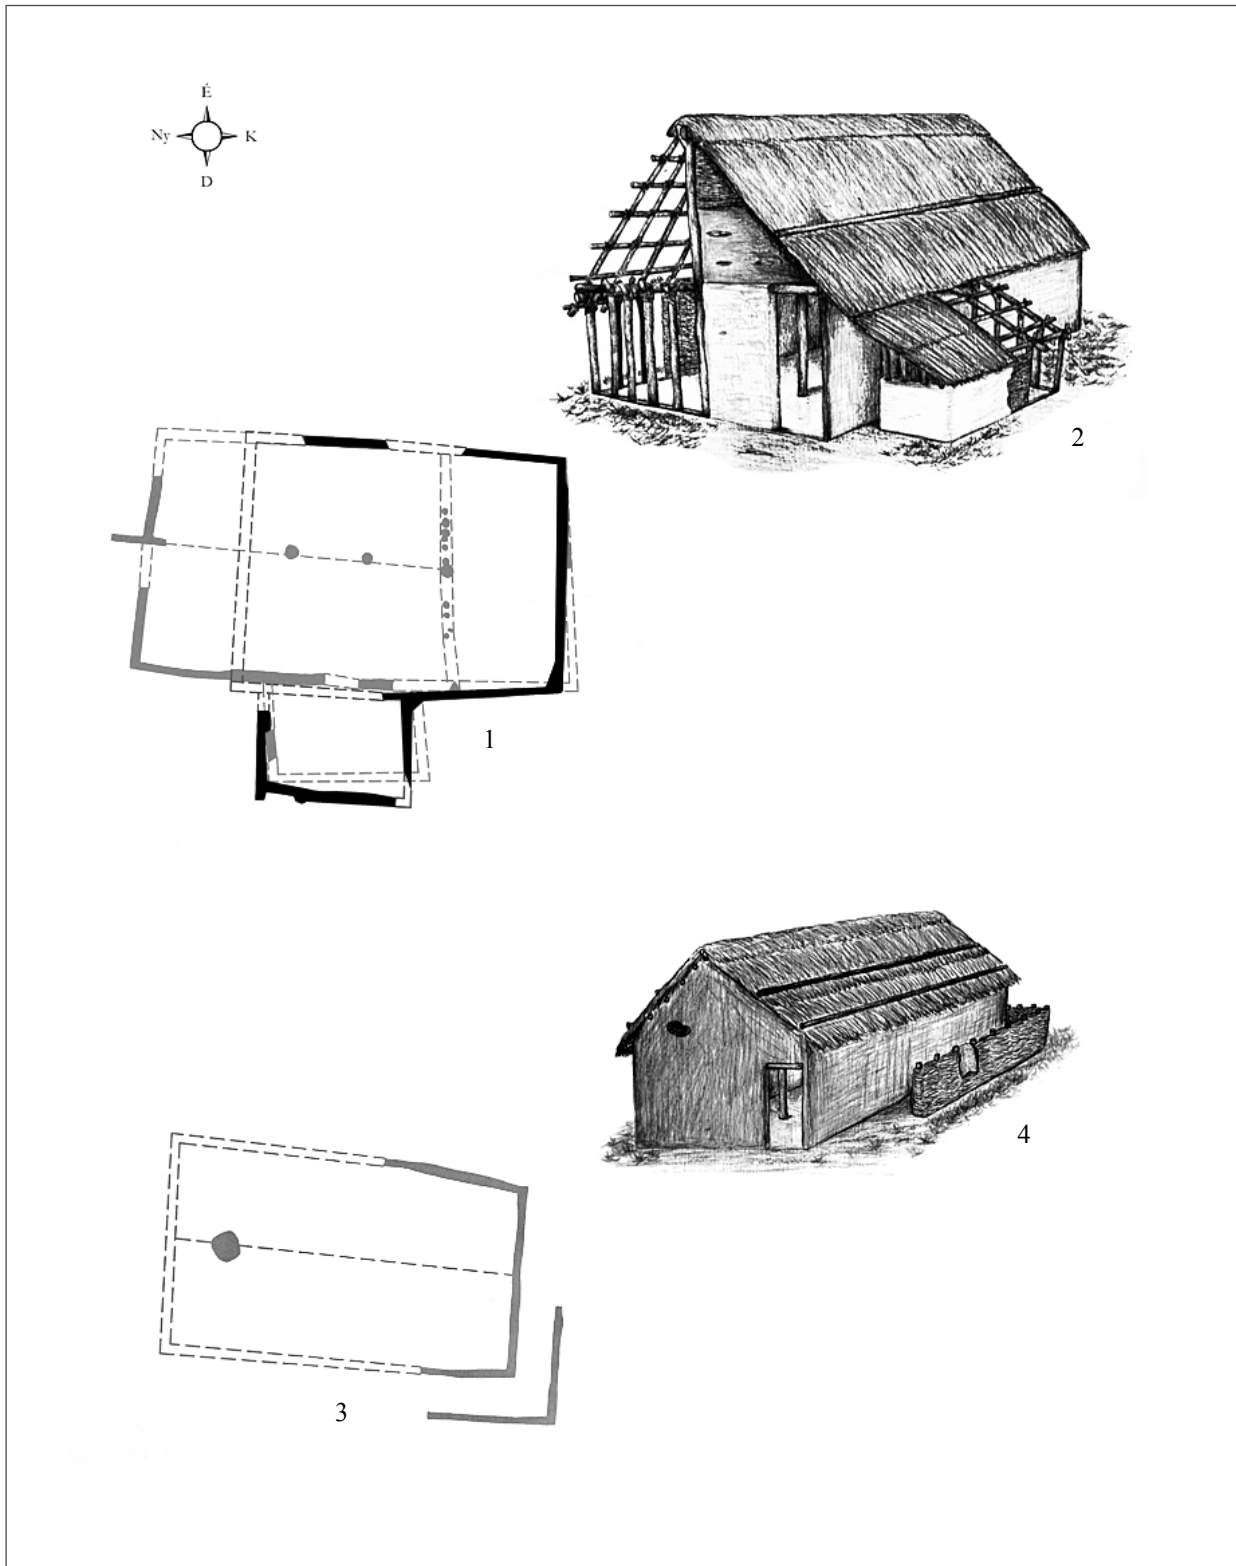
1: Plan reconstruction of house 1/b; 2: Plan reconstruction of house 3.; 3: Plan reconstruction of house 4.;
